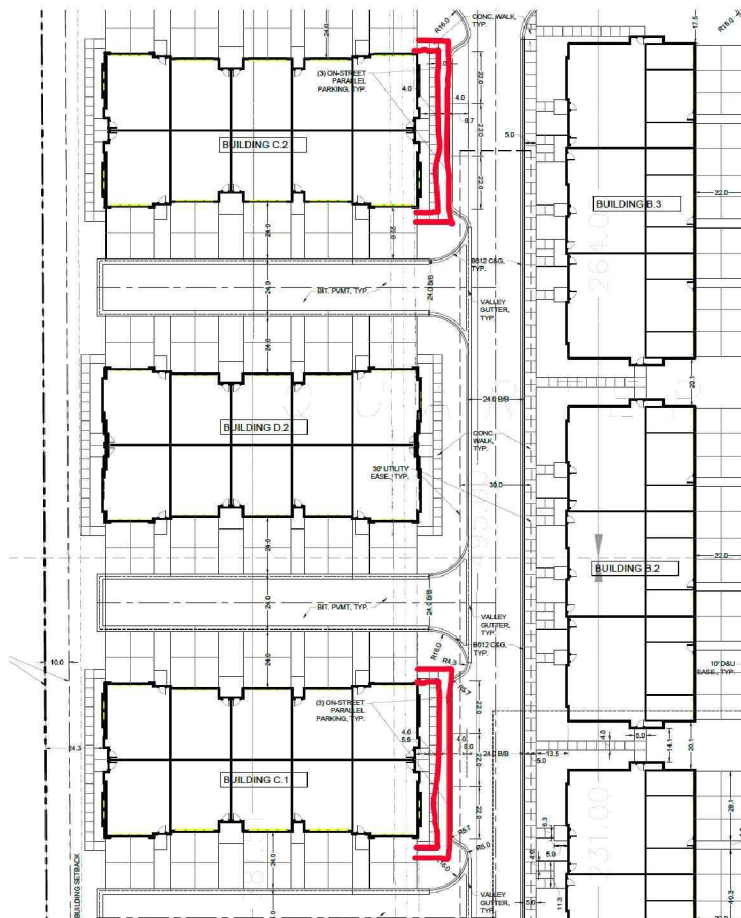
Exhibit B – Recommended Sidewalk Alignment, Buildings C.1 & C.2 Parallel Parking Area
